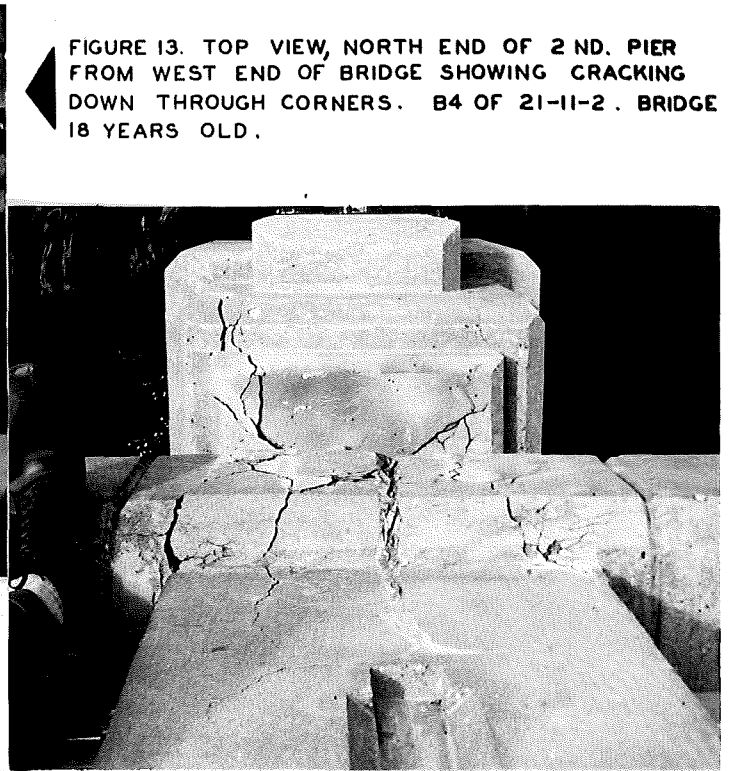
TOP VIEW, NORTH END OF 2 ND. PIER FROM WEST END OF BRIDGE SHOWING CRACKING DOWN THROUGH CORNERS. B4 OF 21-11-2. BRIDGE 18 YEARS OLD.
